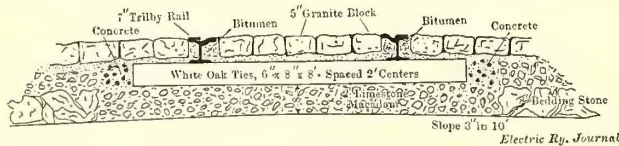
Construction in Block Pavement in Nashville, Tennessee
